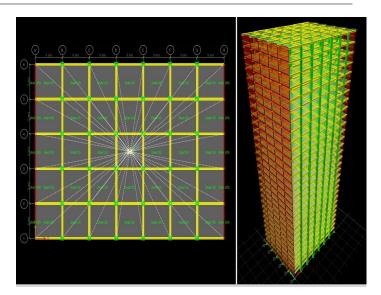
Extrude plan and 3D-view of shear wall structure (Y-direction)
